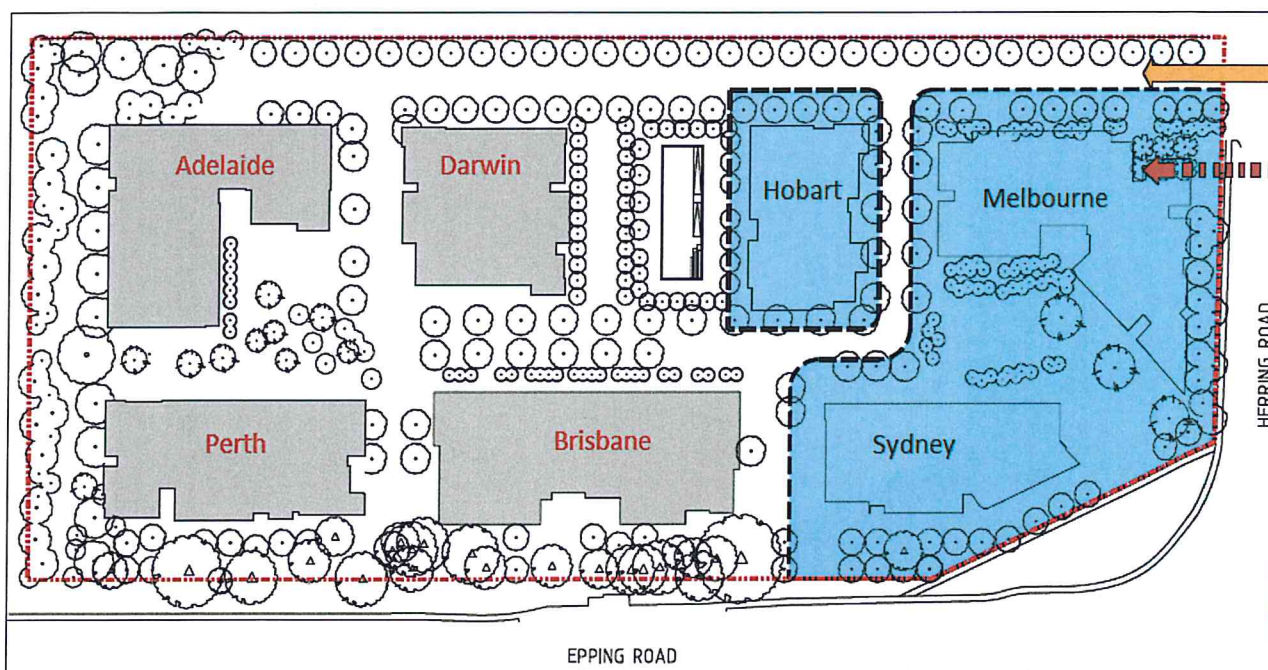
Approved Concept Plan layout and Stage 1 (Stage 2 outlined and shaded in blue)
